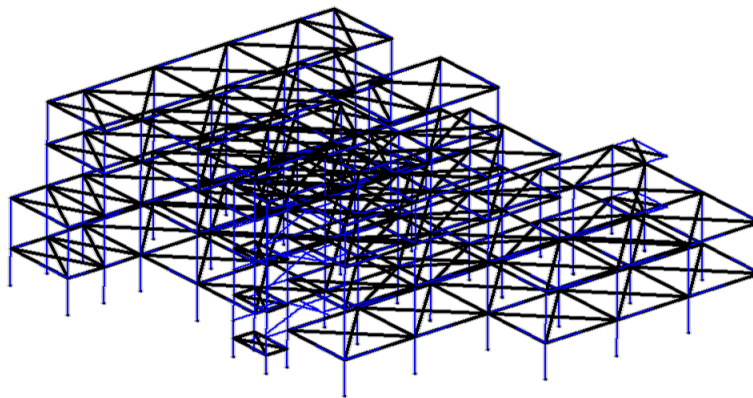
3D view of the bare-frame model with highlighted floor link-system
